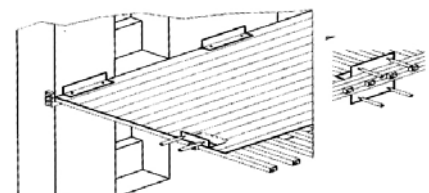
Reinforcement of the connections of wood floors to masonry walls by steel elements (Silva, 2002)
